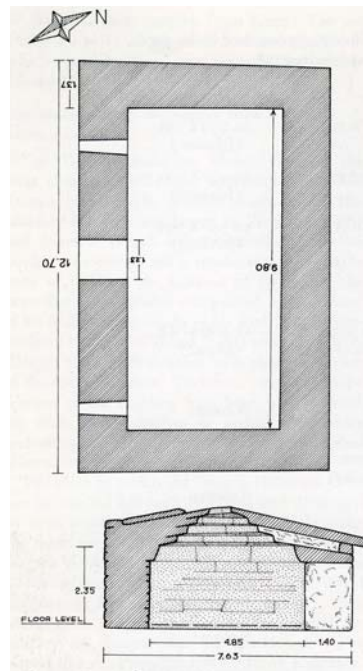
Plan and section of "Dragon House" (Carpenter and Boyd 1977)
